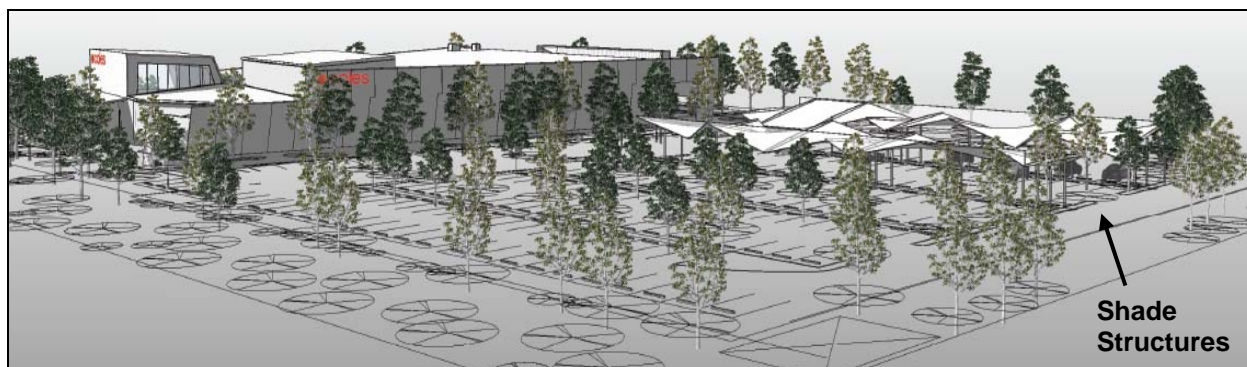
Proposed Shade Structures – View Southeast from Tweed Coast Road (source: proponent)
